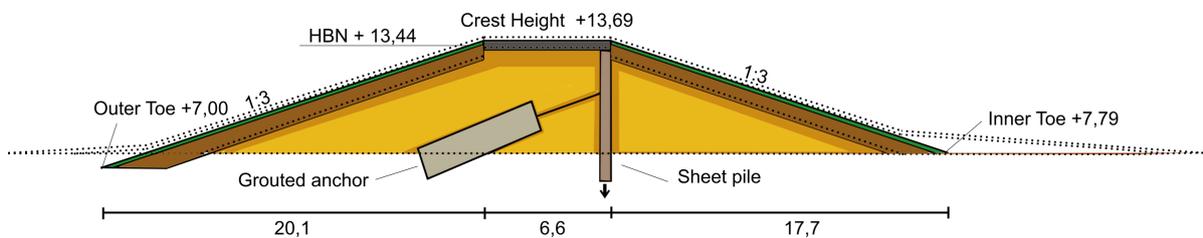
Conceptual design alternative of construction-based reinforcement
